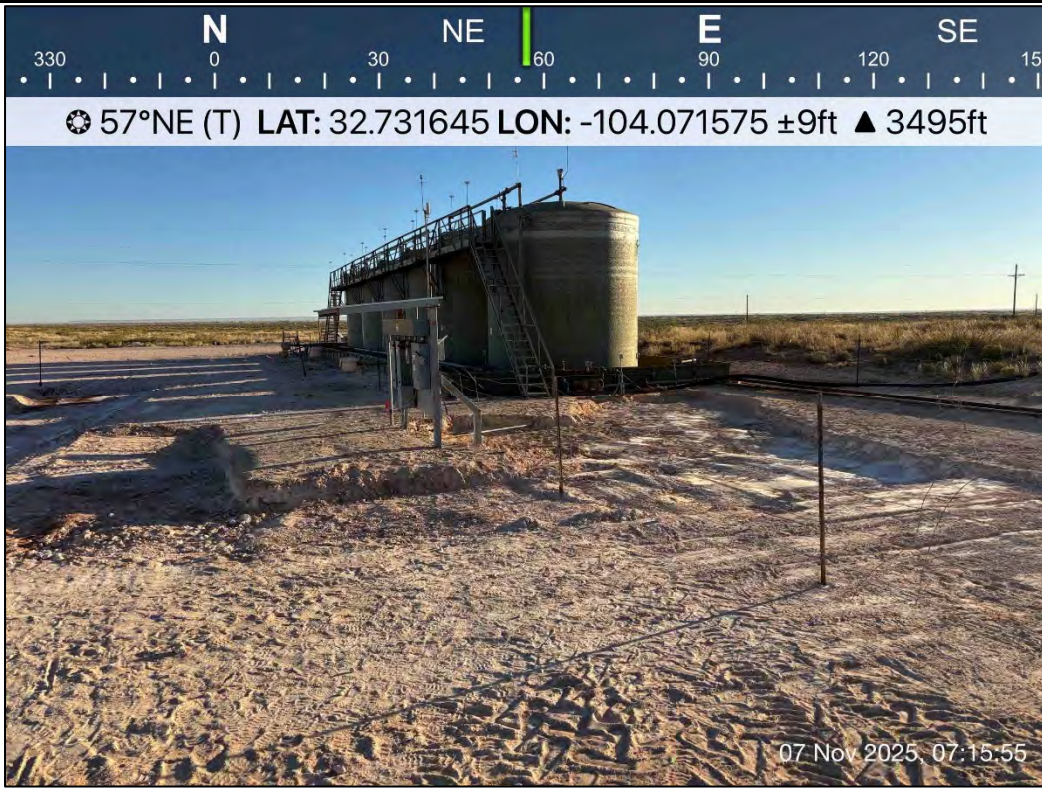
Northeastern view of excavation extent. 11/7/2025
